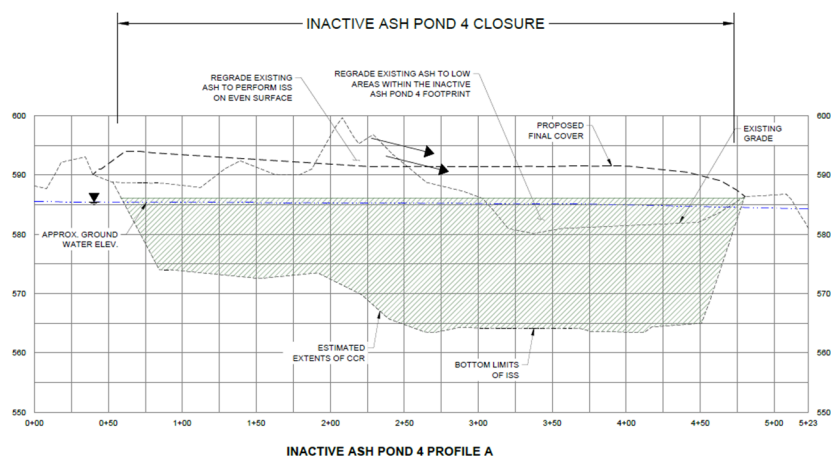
Typical Section for Ash Pond 4 Prior to Closure from Haley & Aldrich (2020)
